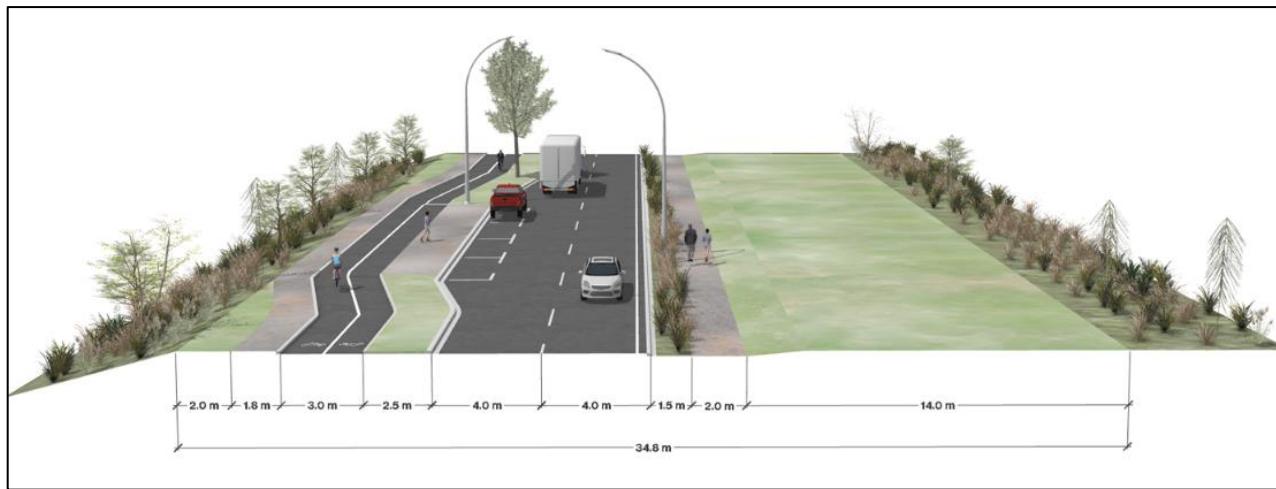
a) Indicative Typical Cross-Section for the East-West Local Road .
